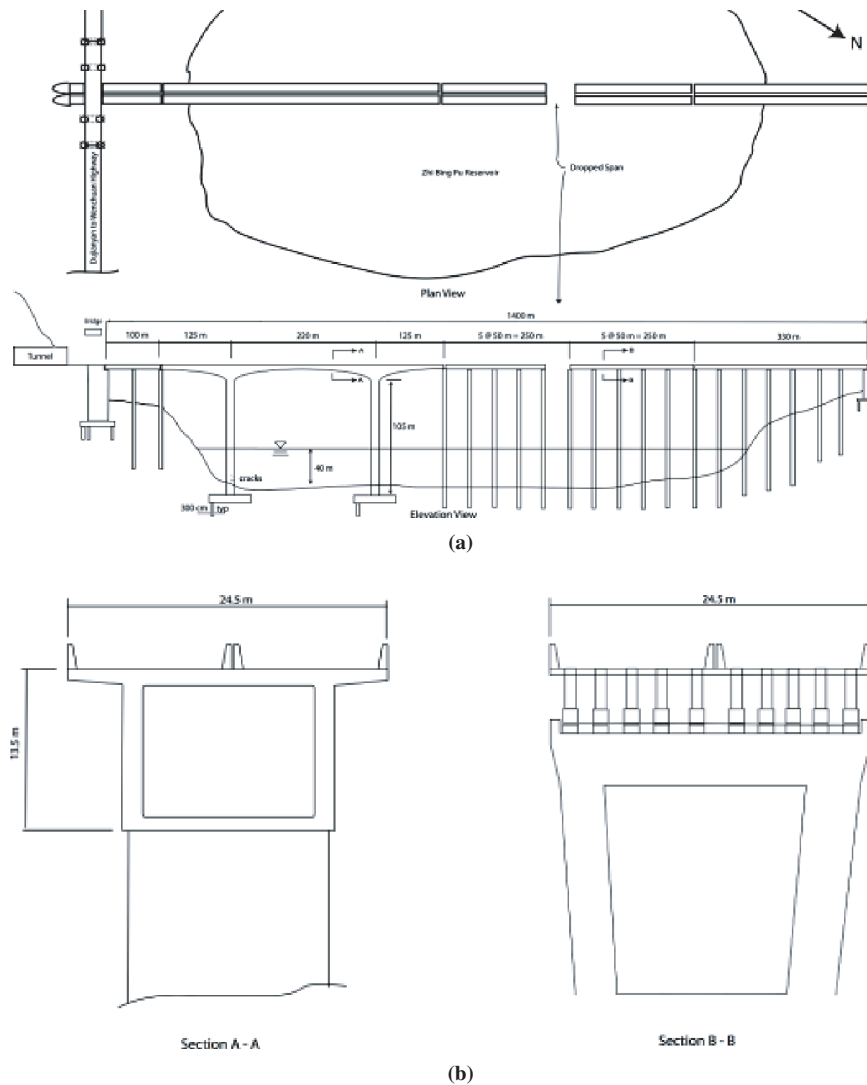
Schematic view of the Miaozhiping Bridge: (a) plan and elevation and (b) cross section of main span and approach bridge.
